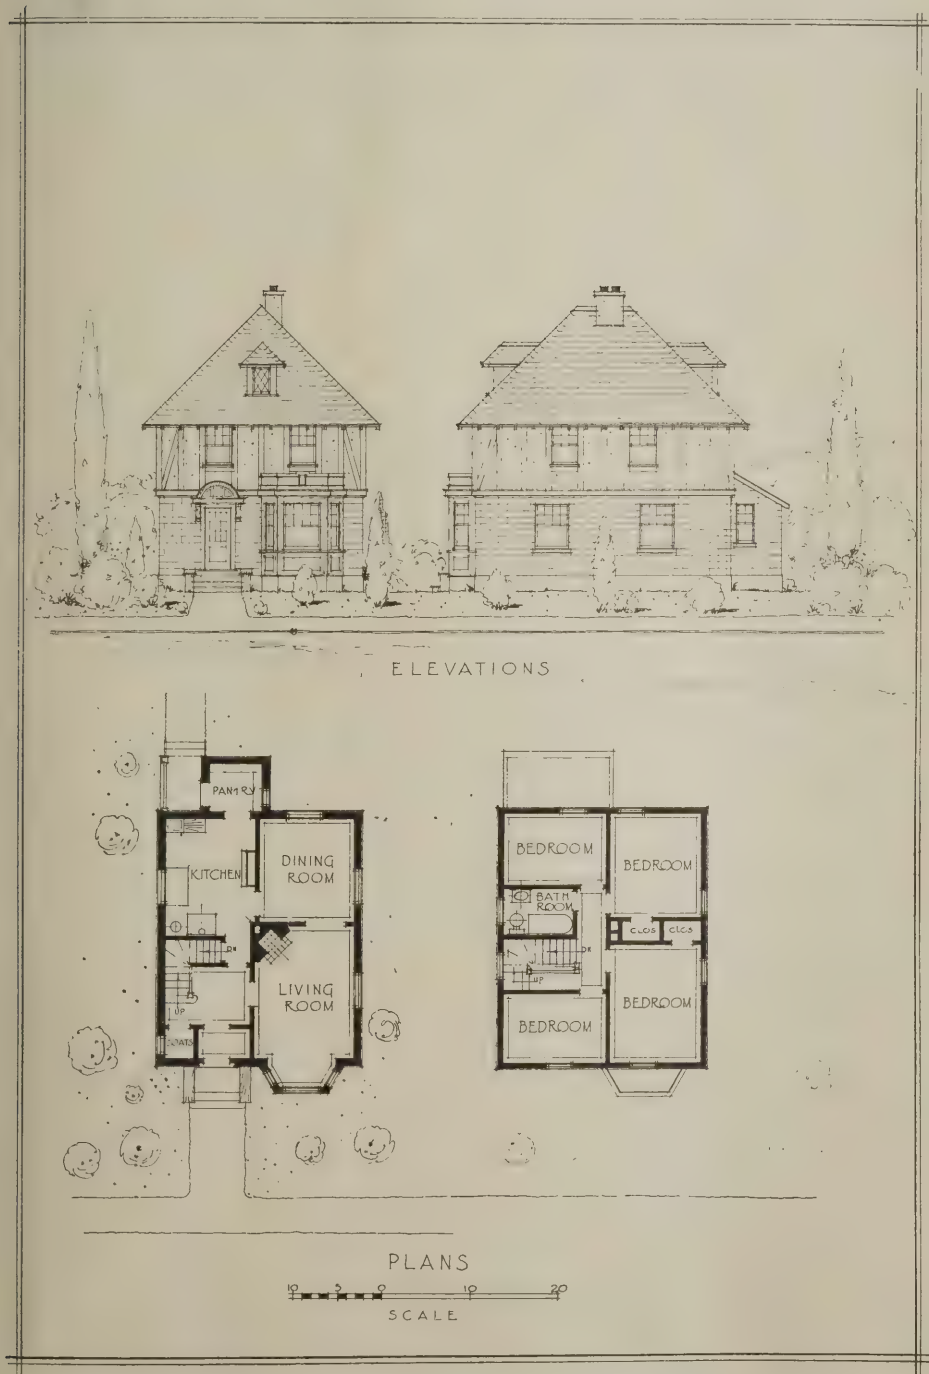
Seven-room house, concrete block and beam-and-stucco surface, with slate roof
